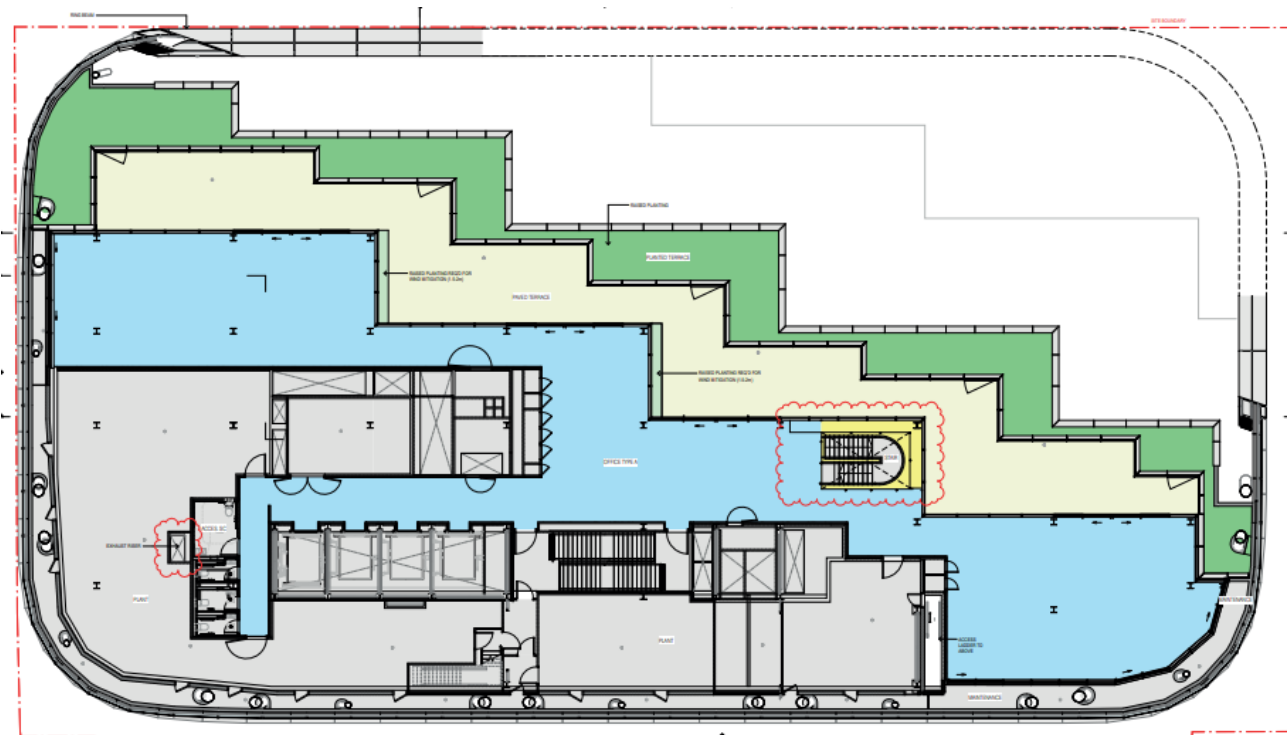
Approved and Proposed Level 37 and 38 Floor Plans
